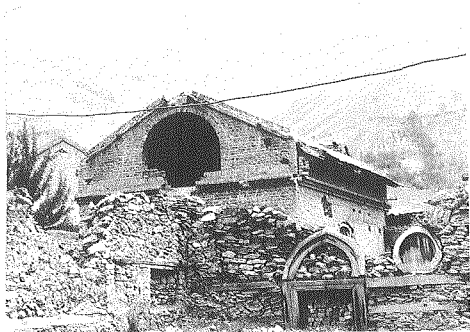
Failure of stone adobe, brick masonry (background) behaved well
